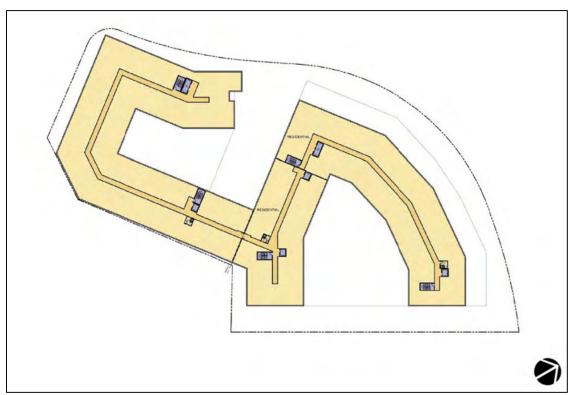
Proposed Sketch Plan (R2-R4 Levels), as submitted May 19, 2017.
